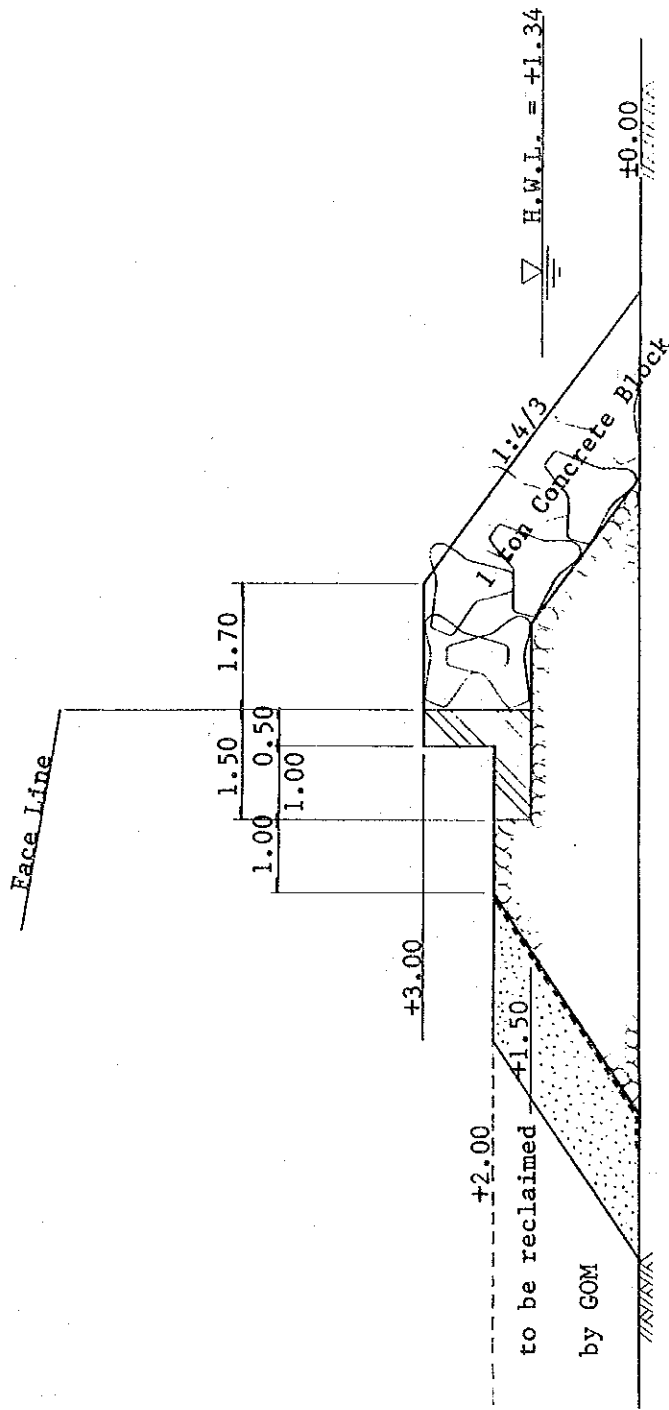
Typical Section of East Coast : North Seawall (S=1:100)
